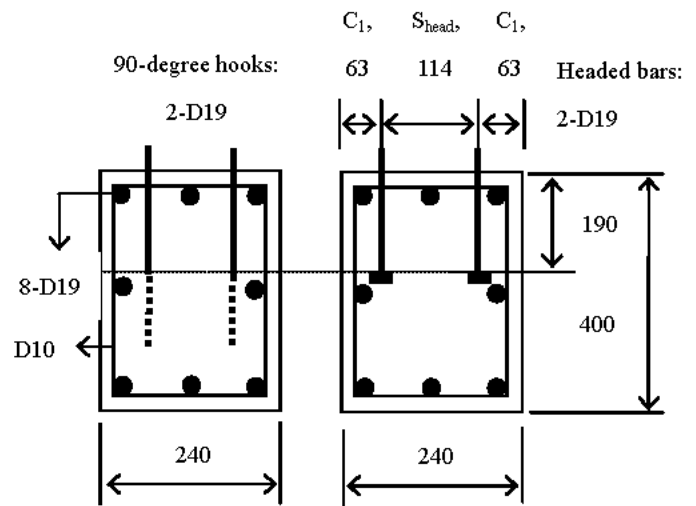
Cross sections of reinforced concrete columns used to compare hooks and headed reinforcement
